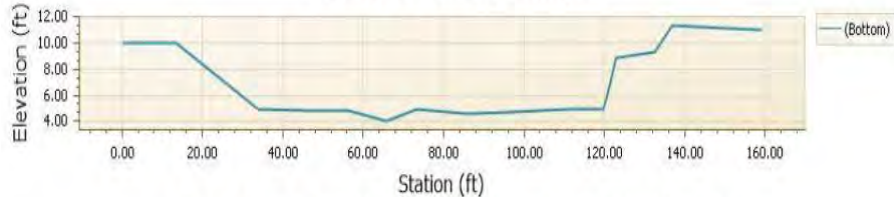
Proposed Alternative 1 Dam Removal Cross Section
